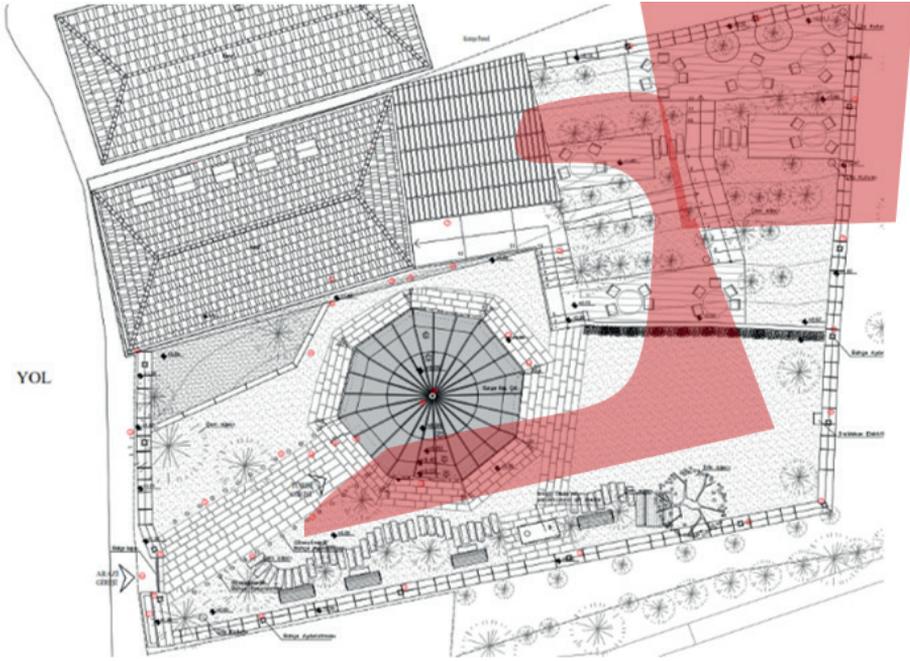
The İsmail Dede Tomb Restoration Project Site Plan Intervention Areas
